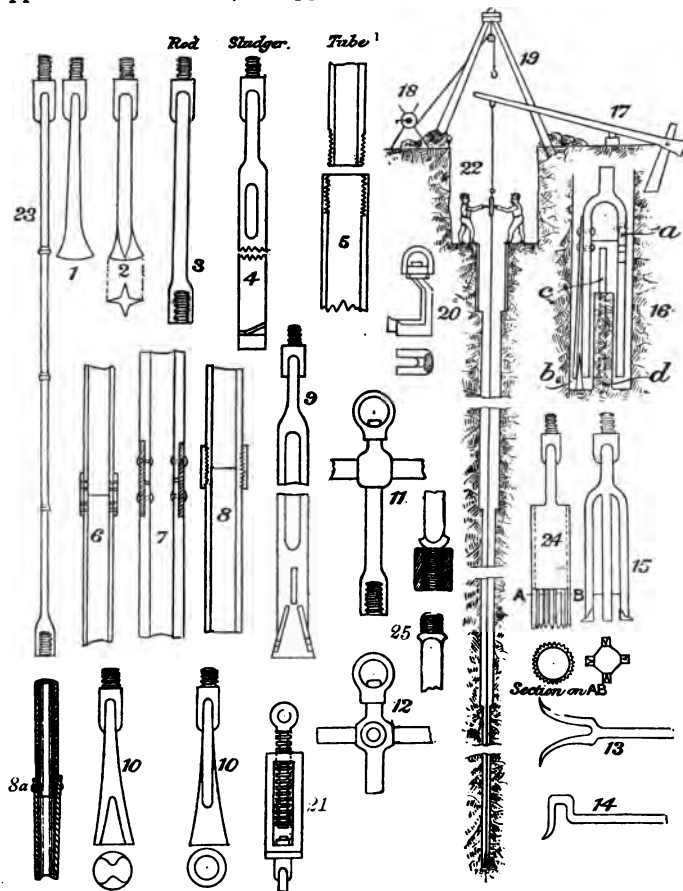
Hand-boring tools. 1, single chisel; 2, cross chisel; 3, rod; 4, sludger (6 ft.); 5, screw-jointed tube; 6, tube with outside collar; 7, tube with flush joint riveted; 8, single cross-head; 9, grappler (6 ft.); 10, reamers; 11, double cross-head; 12, fork; 13, key; 14, core cutter and extractor; 15, spring-pole; 16, windlass; 17, legs and pulleys; 18, hook to lift rods; 19, temper screw; 20, excavation and hole; 21, rods; 22, core-cutter; 23, rods jointed with loose socket.
